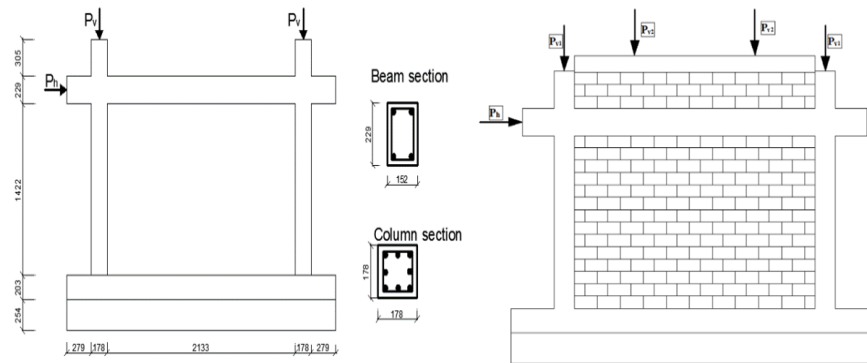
Experimental model of the reinforced concrete (RC) frame with masonry infill
